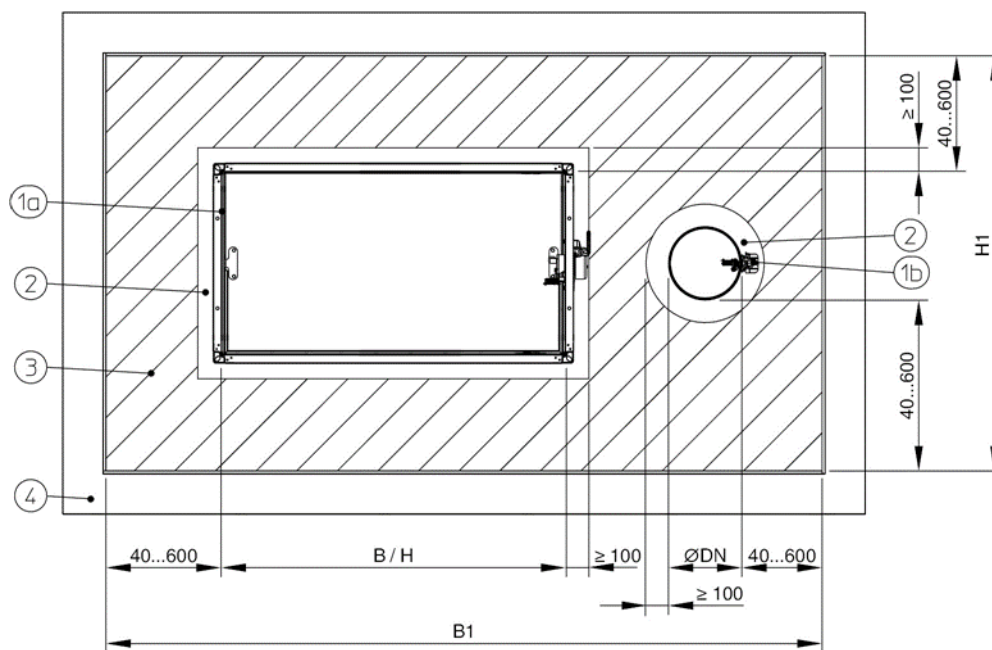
Arrangement in the combined penetration seal FK2-EU and FKRS-EU
